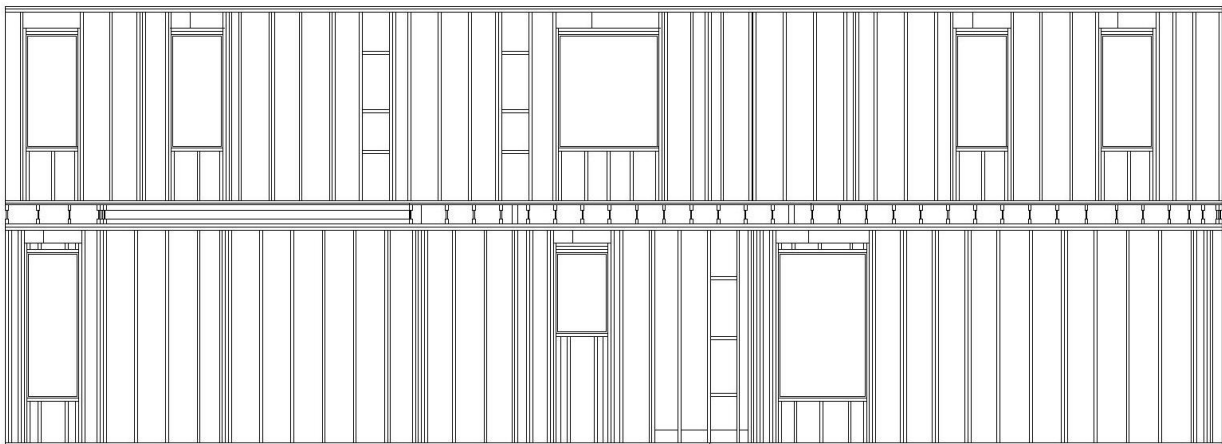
Detached house DH4 west-side elevation with the as-built studs installed on the first and second floors including the rim joist area.
